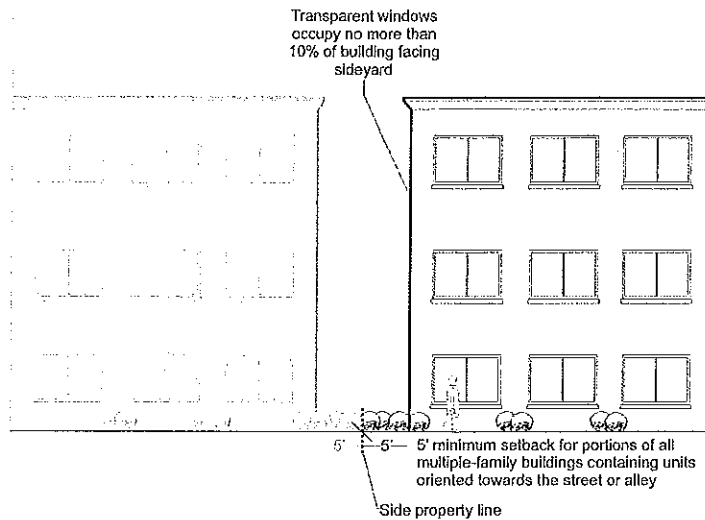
Side yard standards where dwelling units are oriented toward street or alley.
